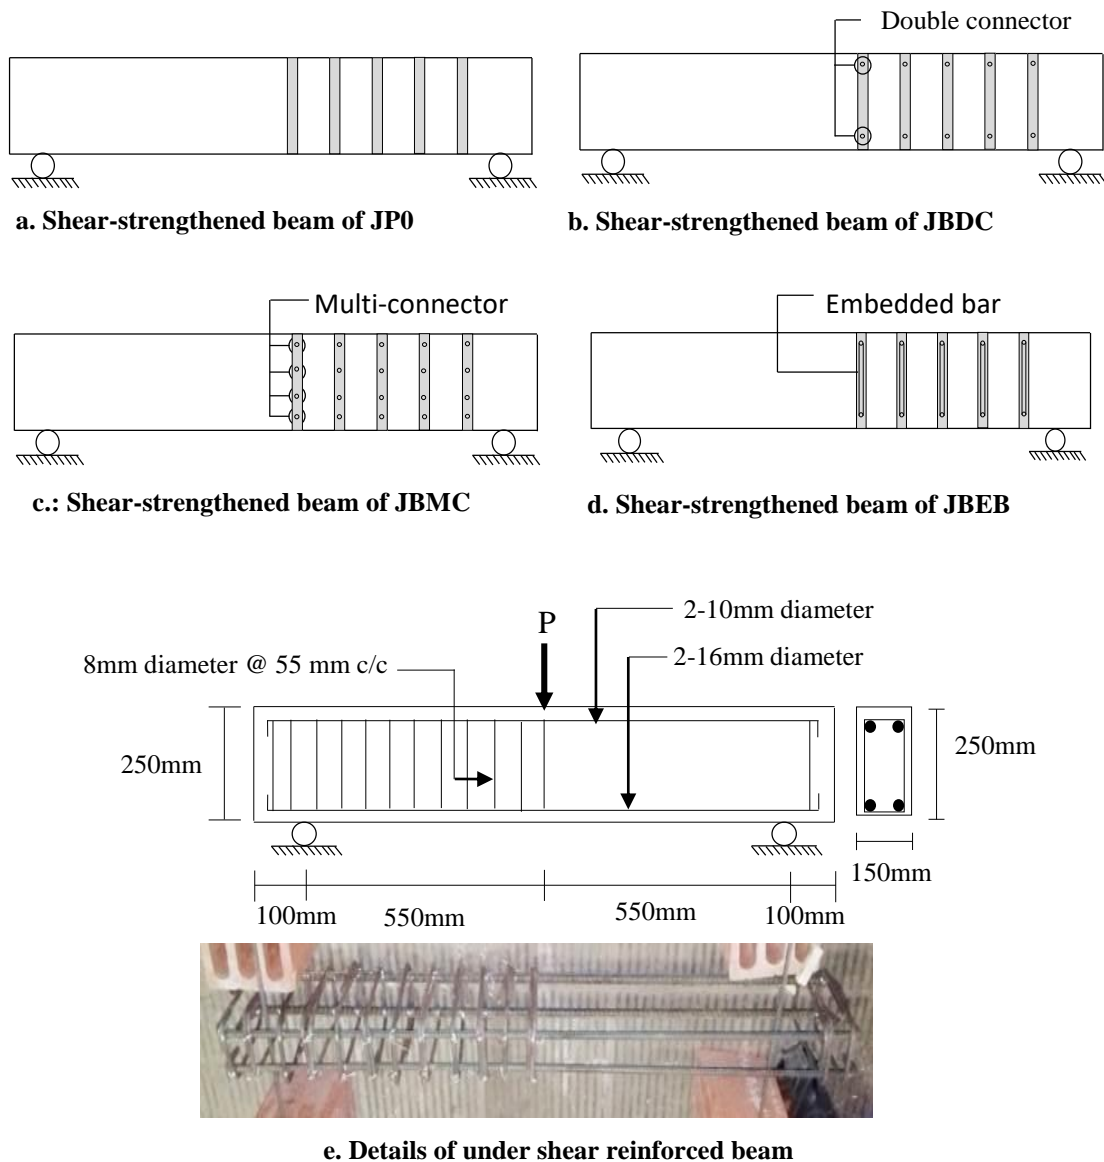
Details of shear-strengthened beam using JFRP laminate and anchors
